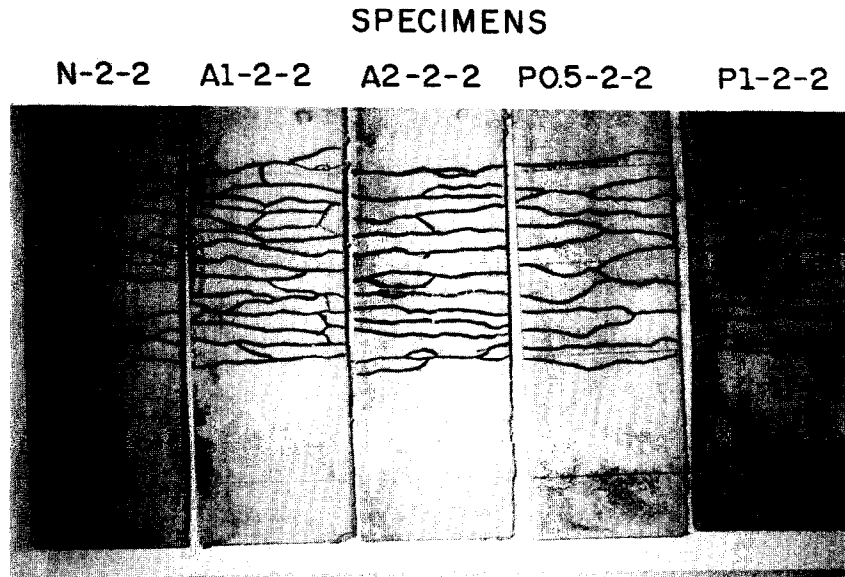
Cracking pattern in specimens with M2 mesh and 50.8 mm transverse wire spacing — specimens: N-2-2; A1-2-2; A2-2-2; P0.5-2-2; and P1-2-2.
